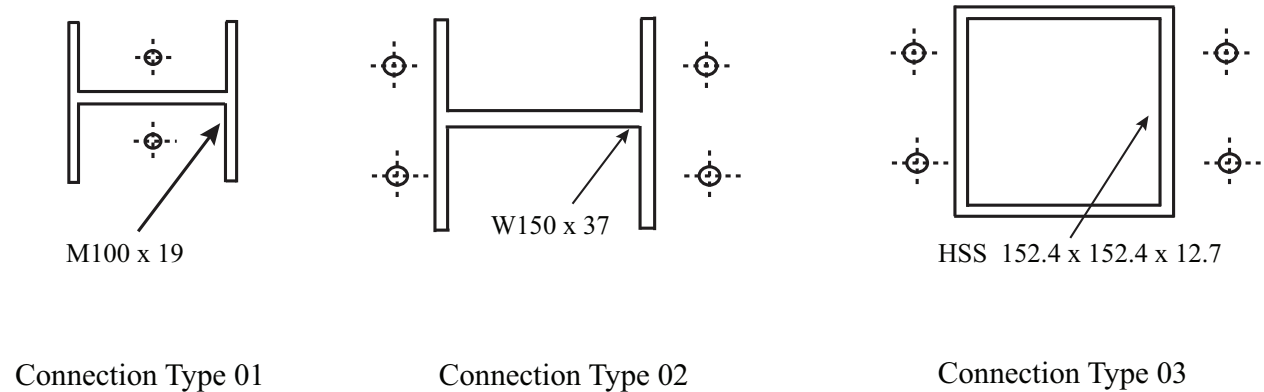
Base Plate Dimensions (Picard and Beaulieu 1985)
